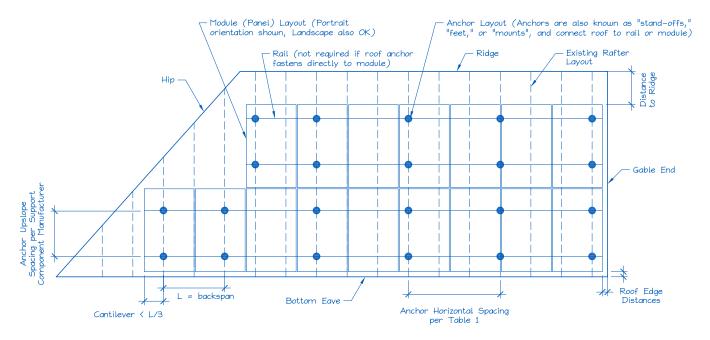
Sample Solar Panel Array and Anchor Layout Diagram (Roof Plan).
